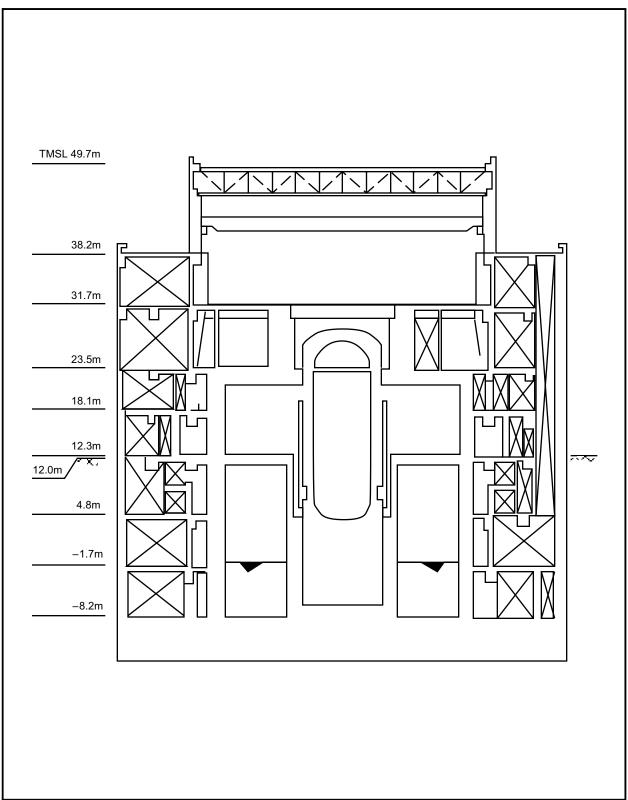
Reactor Building Elevation (90°–270° Section)
